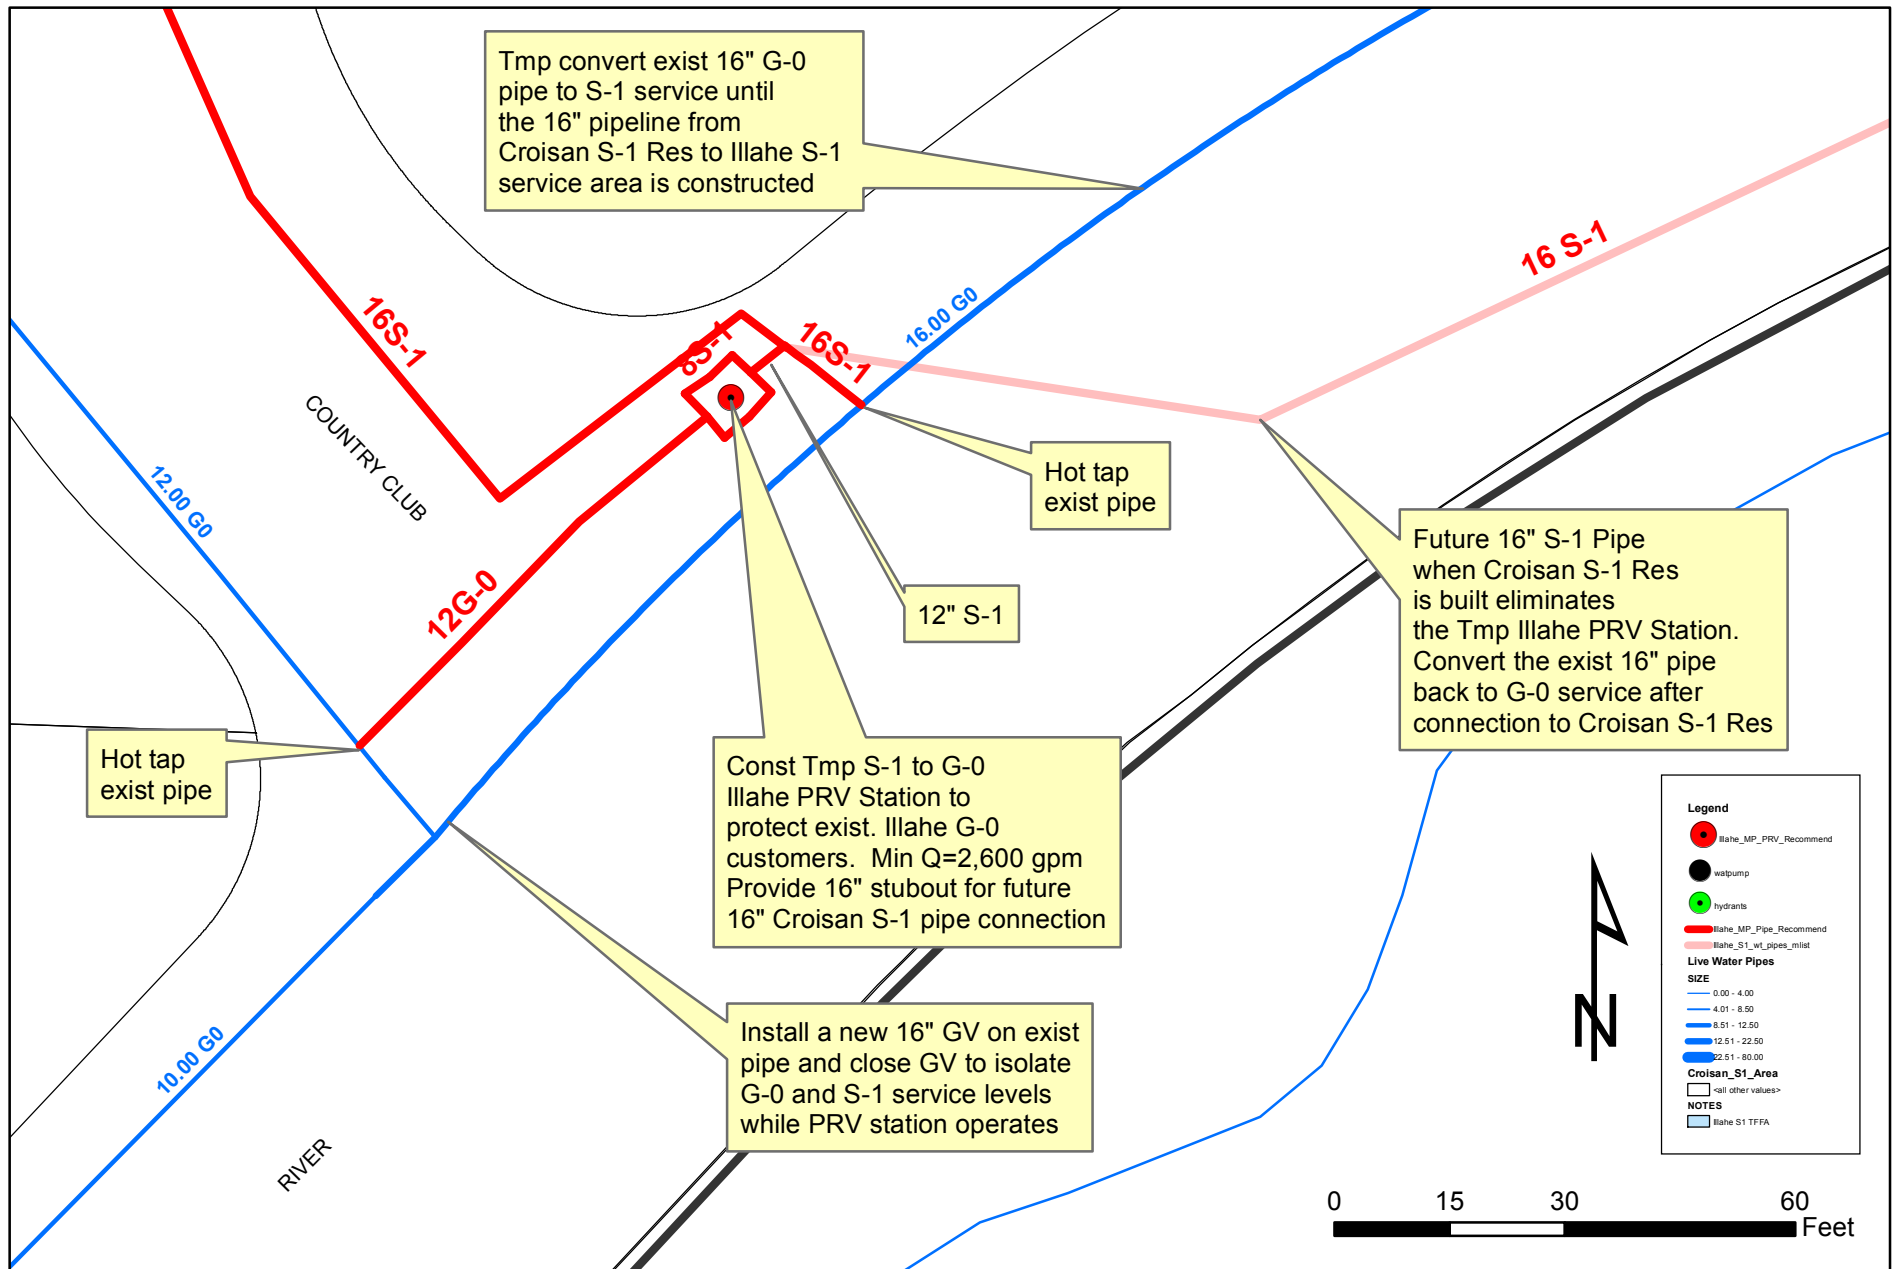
Exhibit A: Illahe S-1 Master Plan Improvement Recommendation
